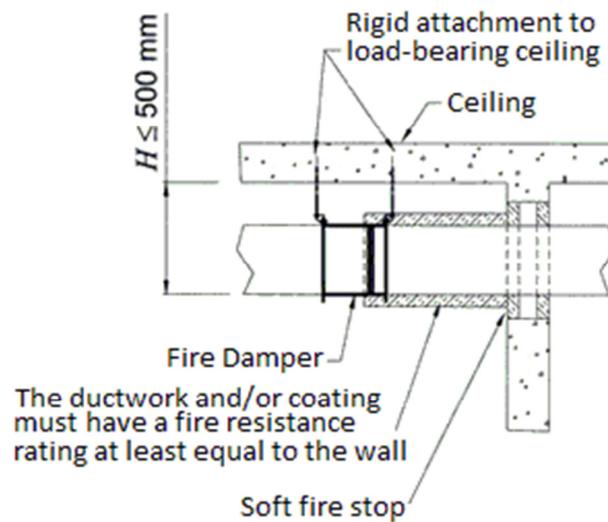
Example of the installation of a fire damper outside the wall opening suspension depth < 500 mm
